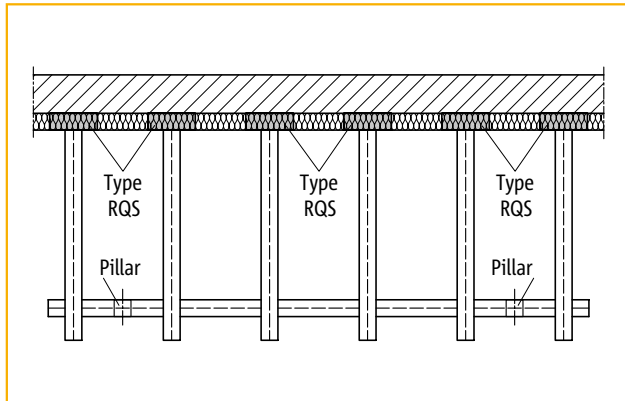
Renewal of an existing balcony using type RQS, supported construction
